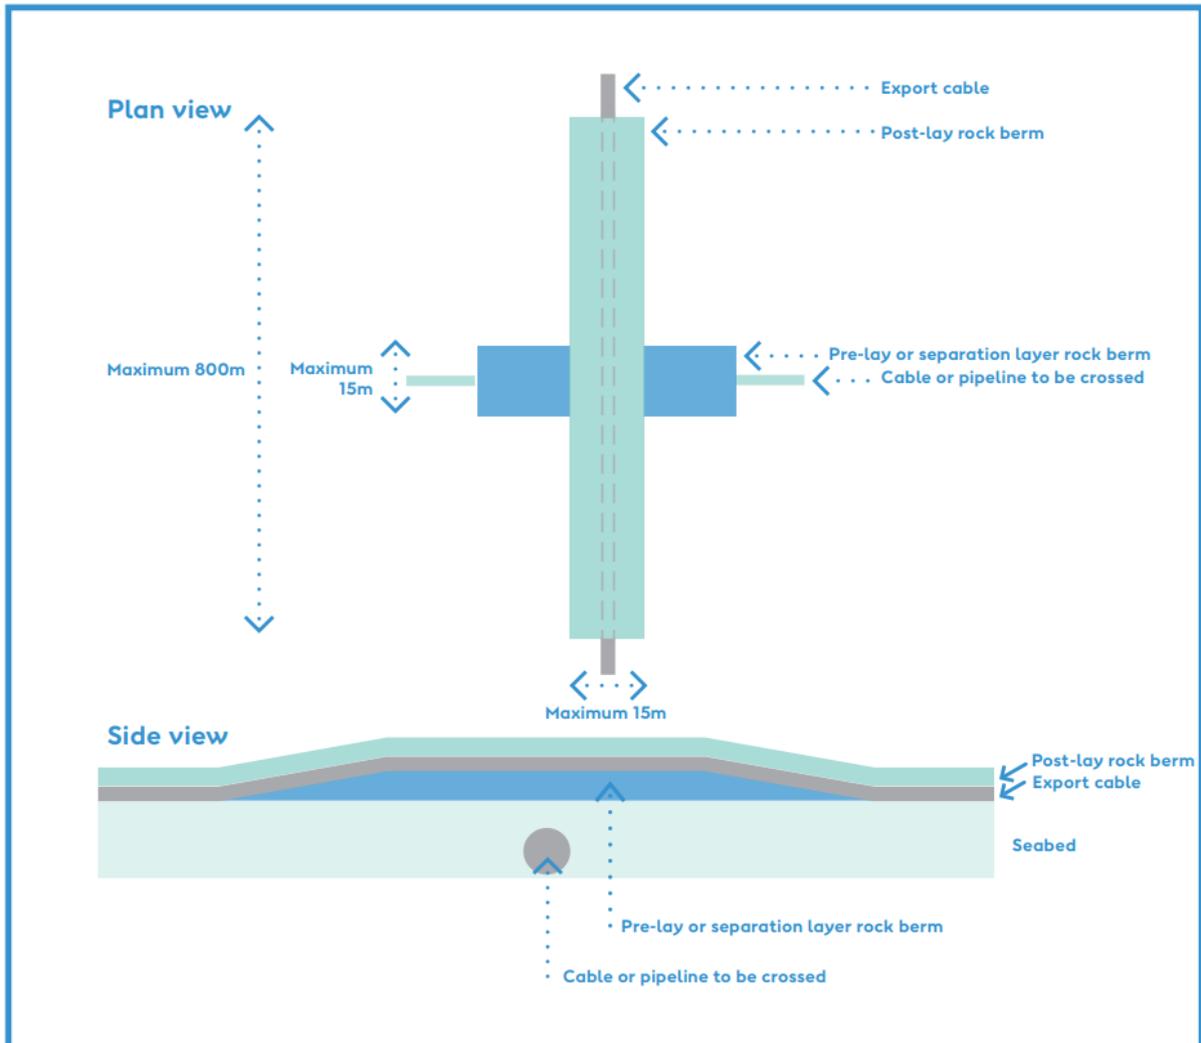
Cable crossing with use of separation layer and post-lay rock berm
